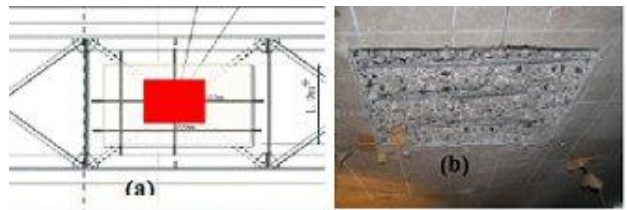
Deck Ceiling Damage:(a)schematic and (b)real image
